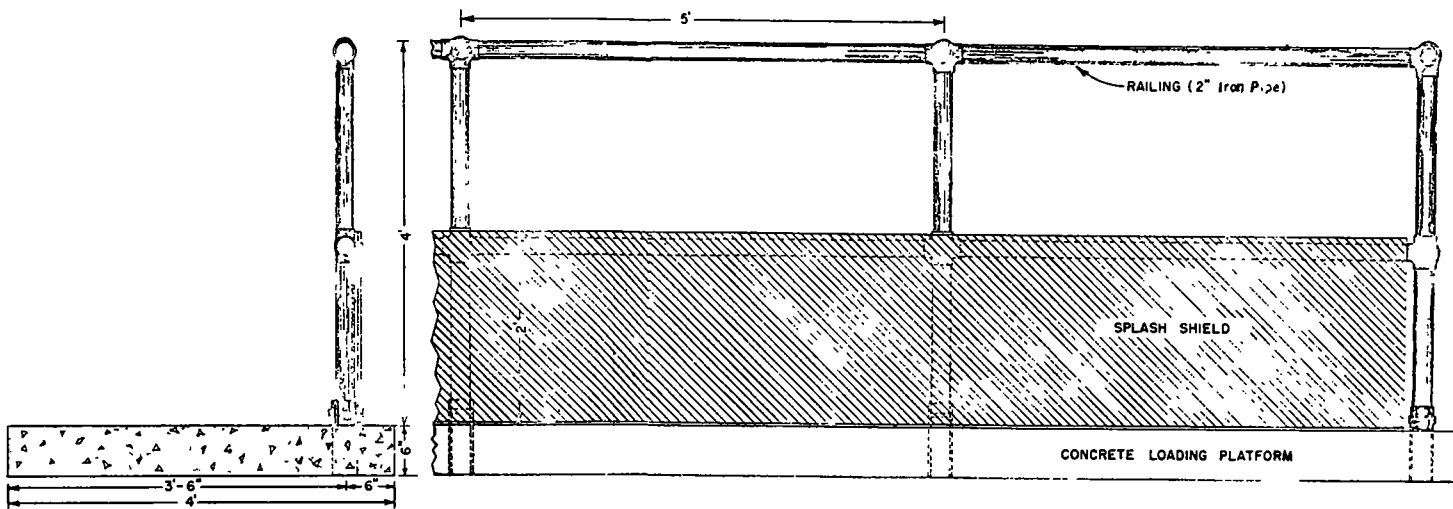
Typical passenger loading island detail, Washington Street bus lane, Chicago, Ill
